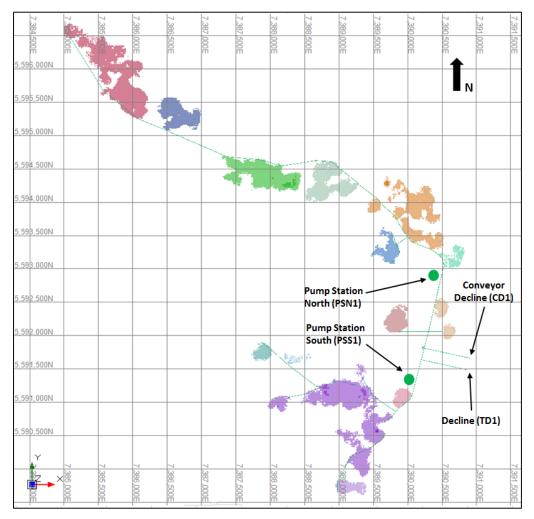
Plan View of UG Design and preliminary location of pumping stations
